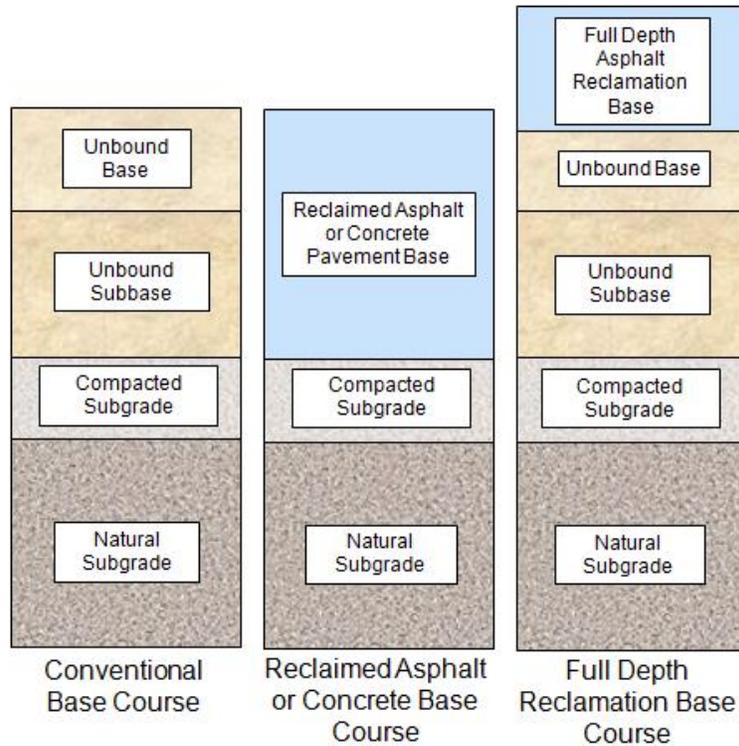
Reclaimed Asphalt and Concrete Pavement Base Layers
